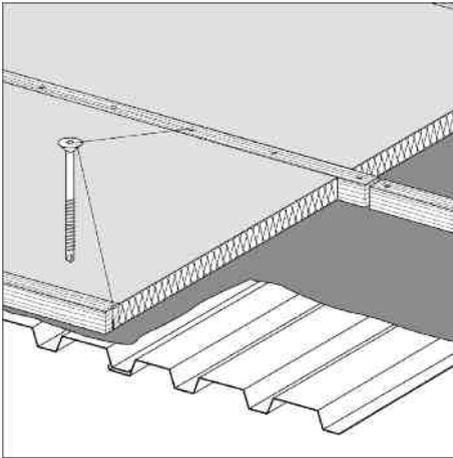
Fastening square timber to trapezoidal sheet liner trays
